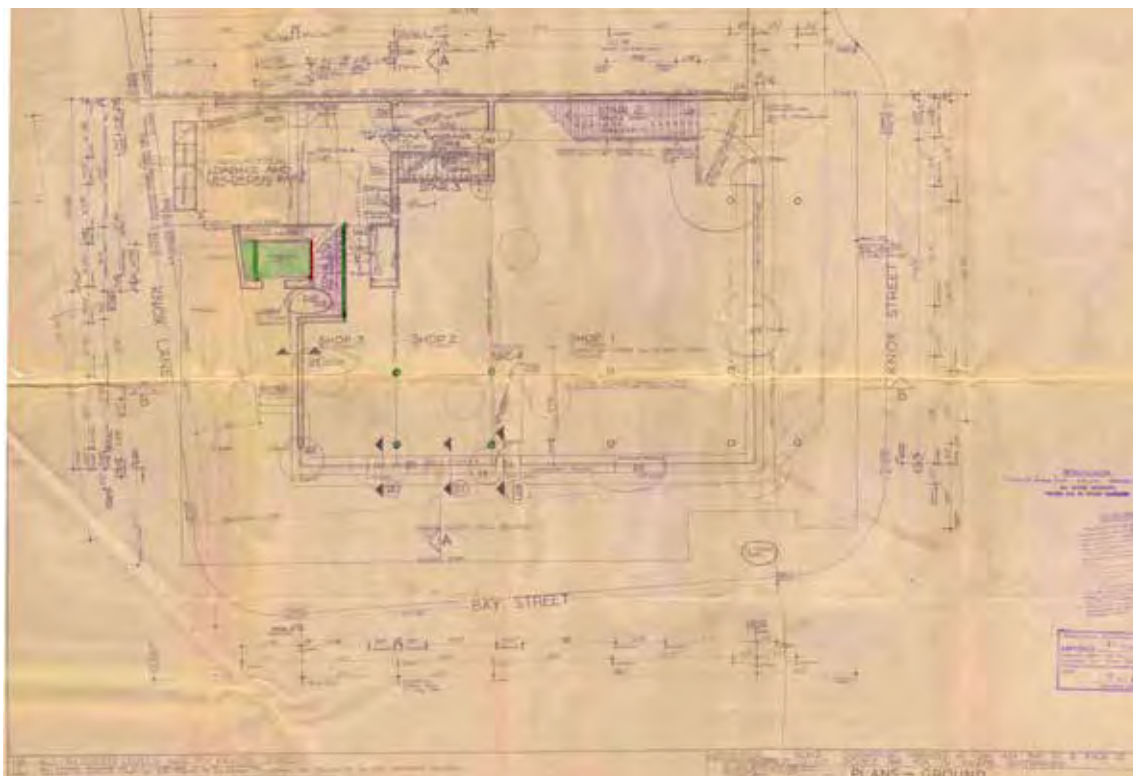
| Ground floor plan of the Gruzman design. The loading dock has since been replaced with a cafe. (Source: BA file BA 1546/1971)
